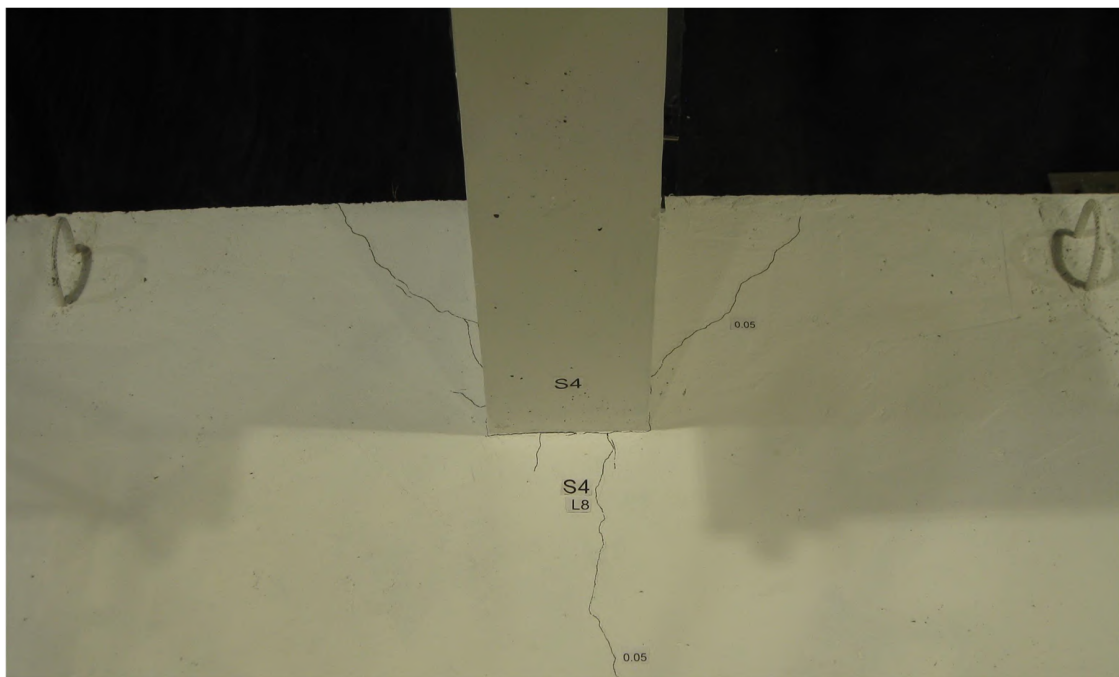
Specimen 4 slab cracks at $V = 96.0$ kN
